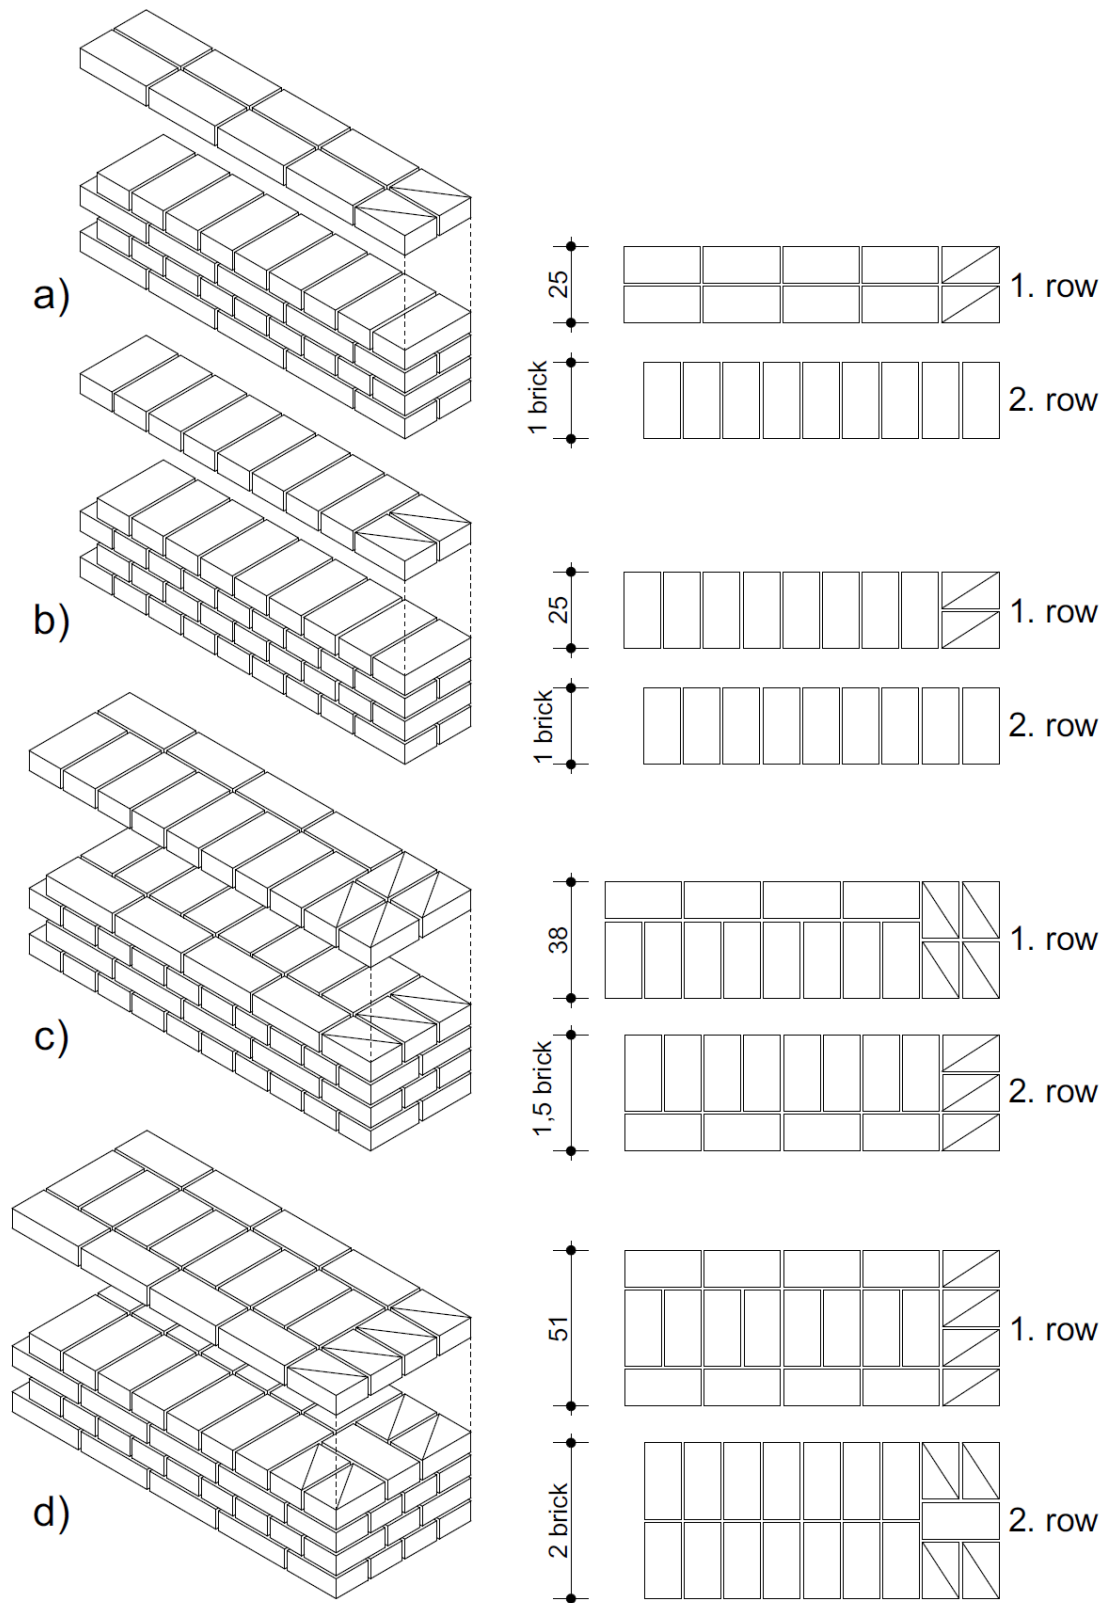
a)-b) one-brick wall heder and strecher bond, c) english bond of half-and one-brick wall, d) english bond of two-brick wall
